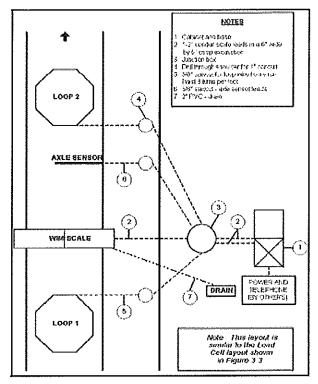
4 Example of Sensor Layout using Bending Plate System (McCall and Vodrazka 1997)
